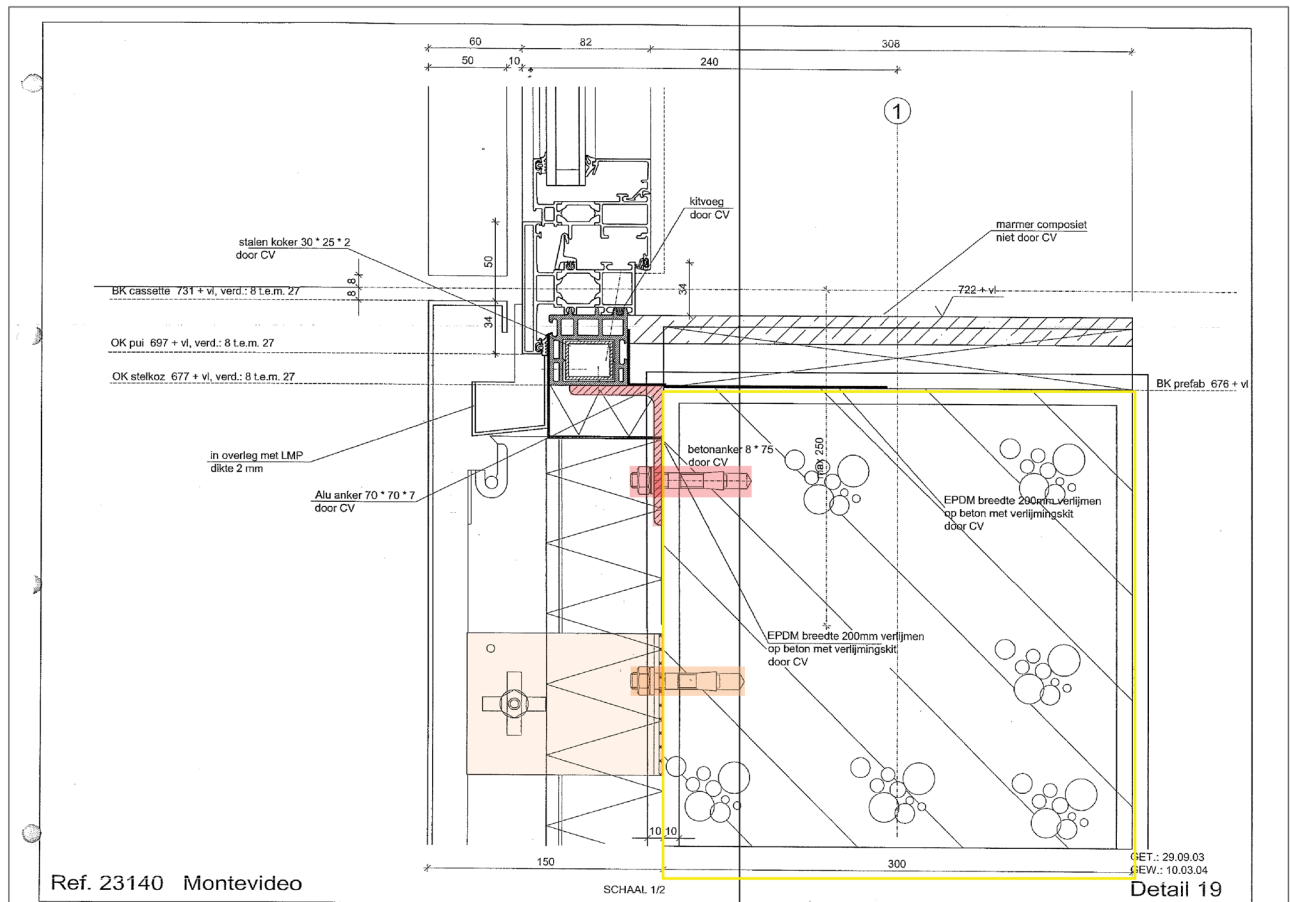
| Detail drawing of the lower part of the facade of the Montevideo with the light grey cassettes. Light blue: Yellow: the prefabricated concrete slab. Orange: fixing system of the cassettes to the slab. Red: fixing system of the window frame to the cassette | Source: Mecanoo, Municipal Archives Rotterdam
